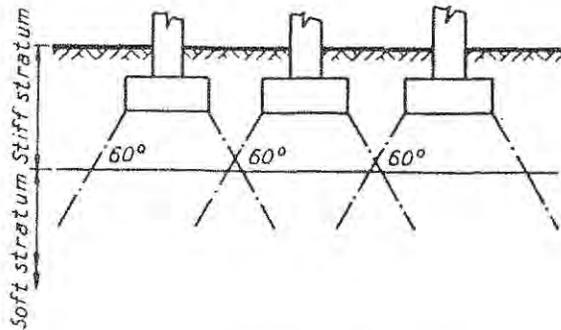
CLOSE-SPACED FOUNDATIONS
